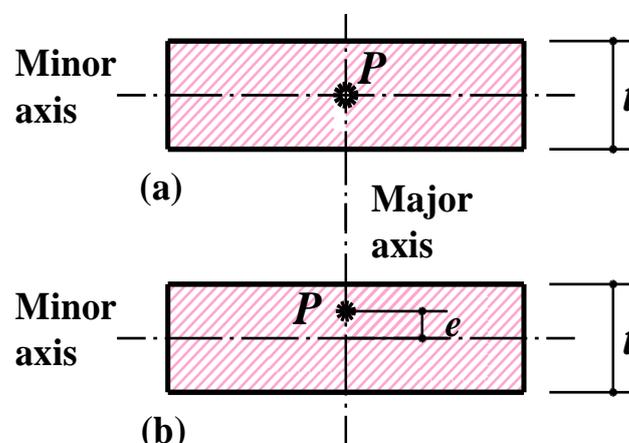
Masonry Wall Plan With: (A) Axial Vertical Load, (B) Eccentric Vertical Load
